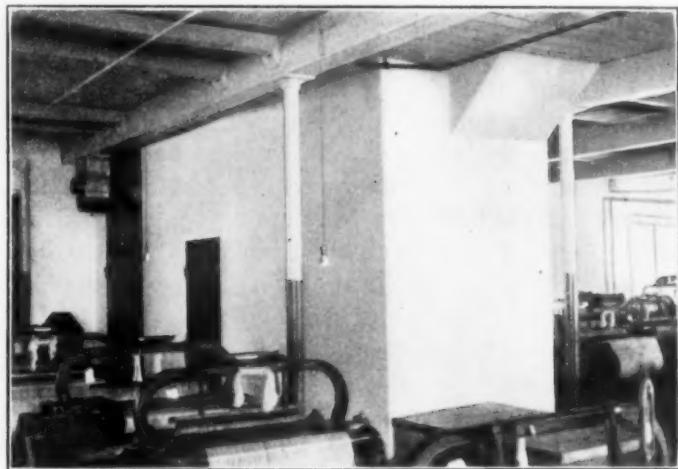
WEAVE ROOM, SECOND STORY. NOTE FIRE DOOR WITH REMOVABLE PANELS ABOVE TO ALLOW ACCESS TO PULLEY ON LINESHAFT
